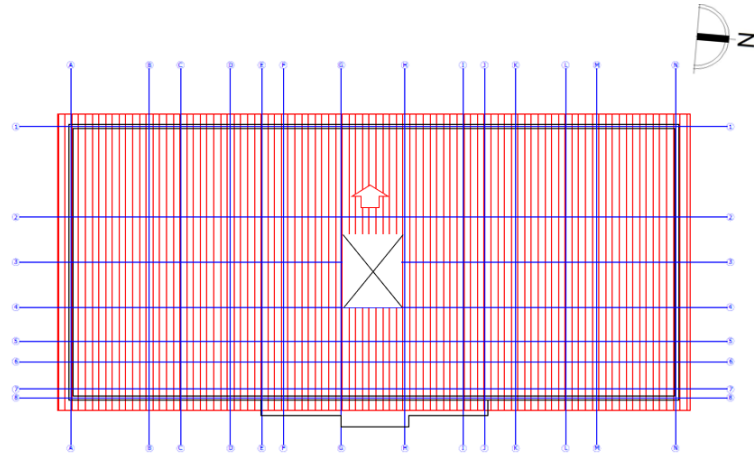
Roof Plan of Case Study Two (Ivy Apartments)
